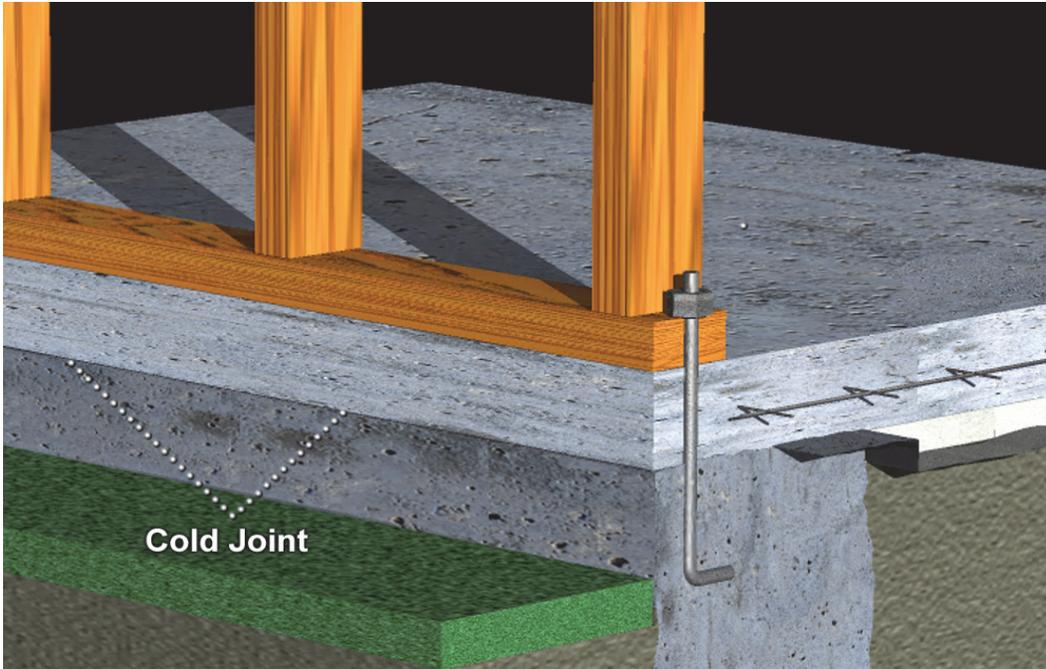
Continuous footing at perimeter of a slab-on-grade—two-pour system with cold joint between slab and footing (image credit: Exponent).
